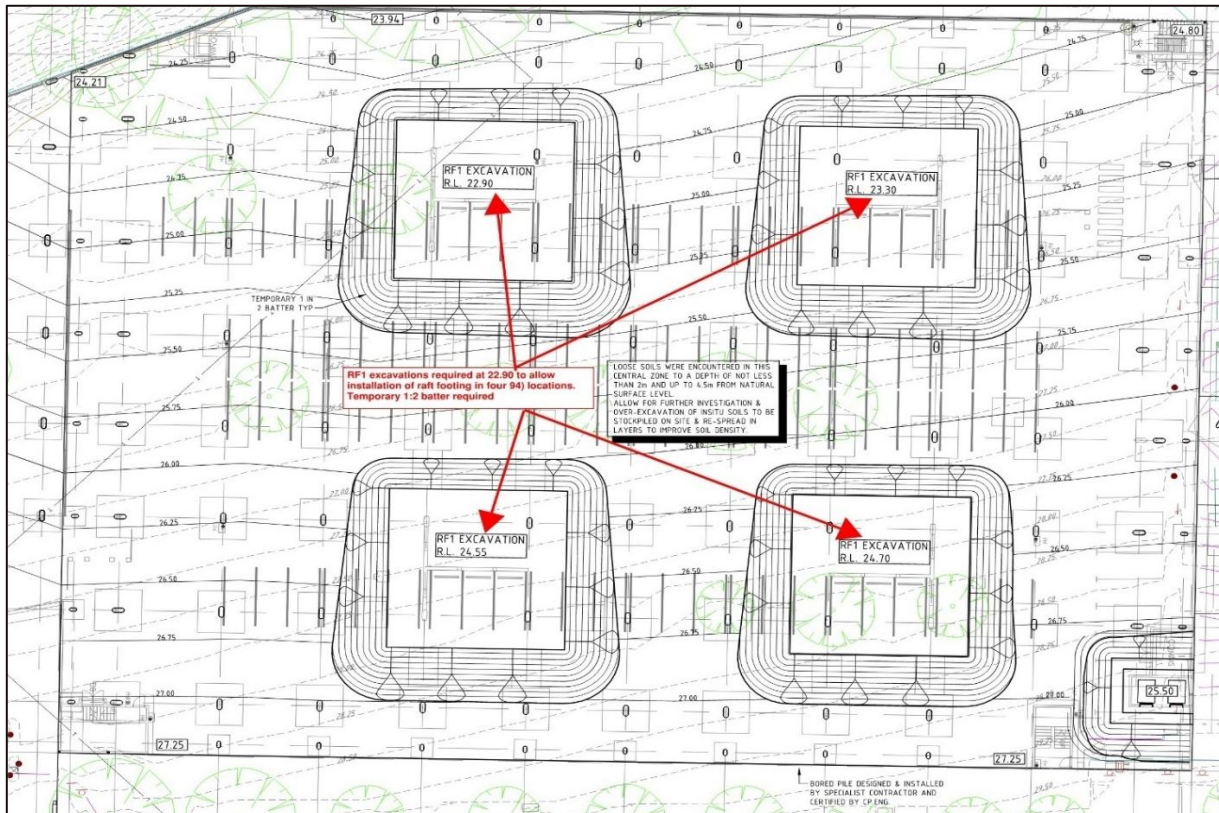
Concrete structure foundations levels and excavations for Multideck Carpark
